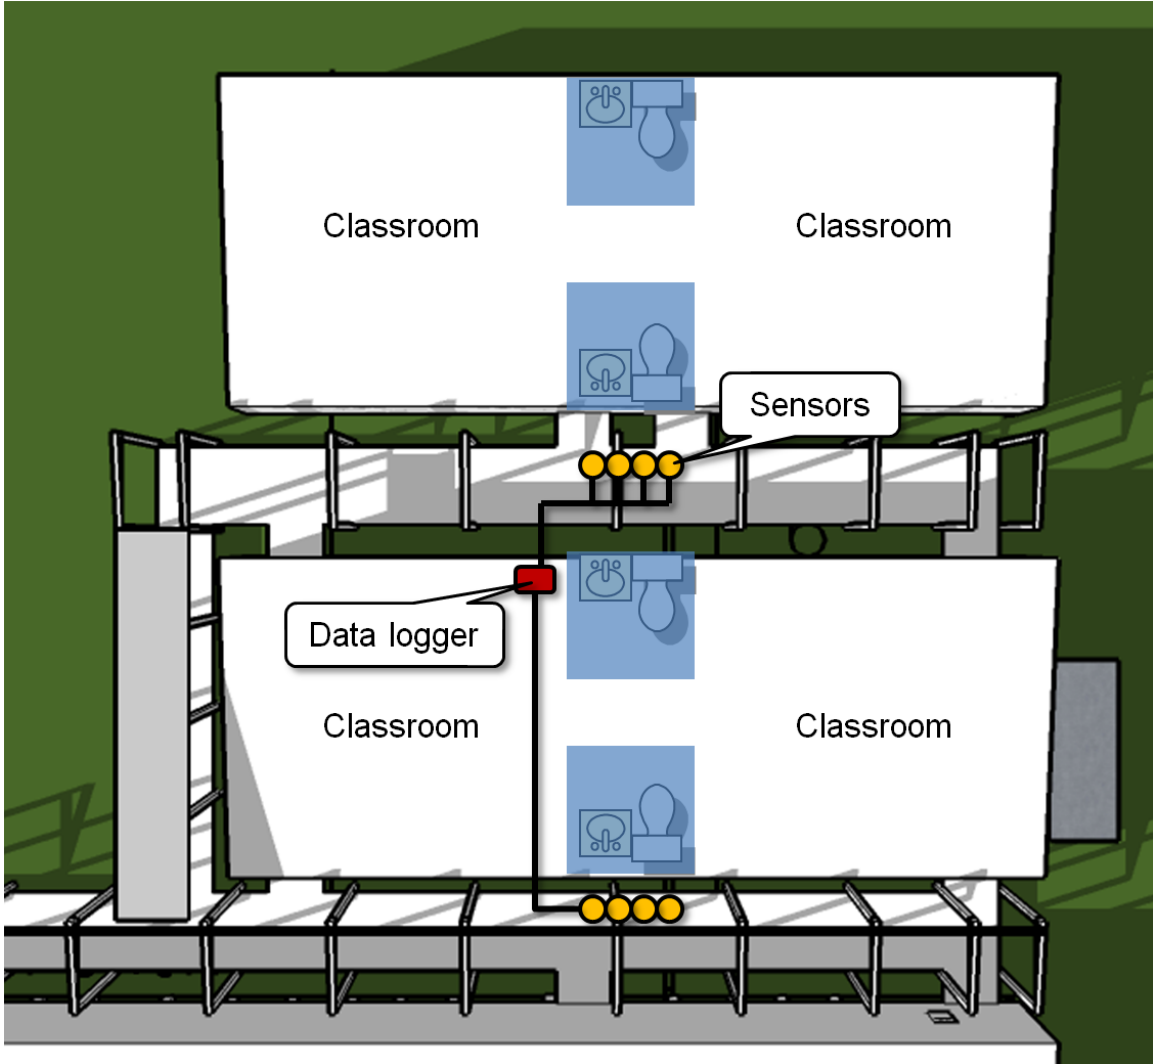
Aerial view of classrooms and sensor equipment location.
